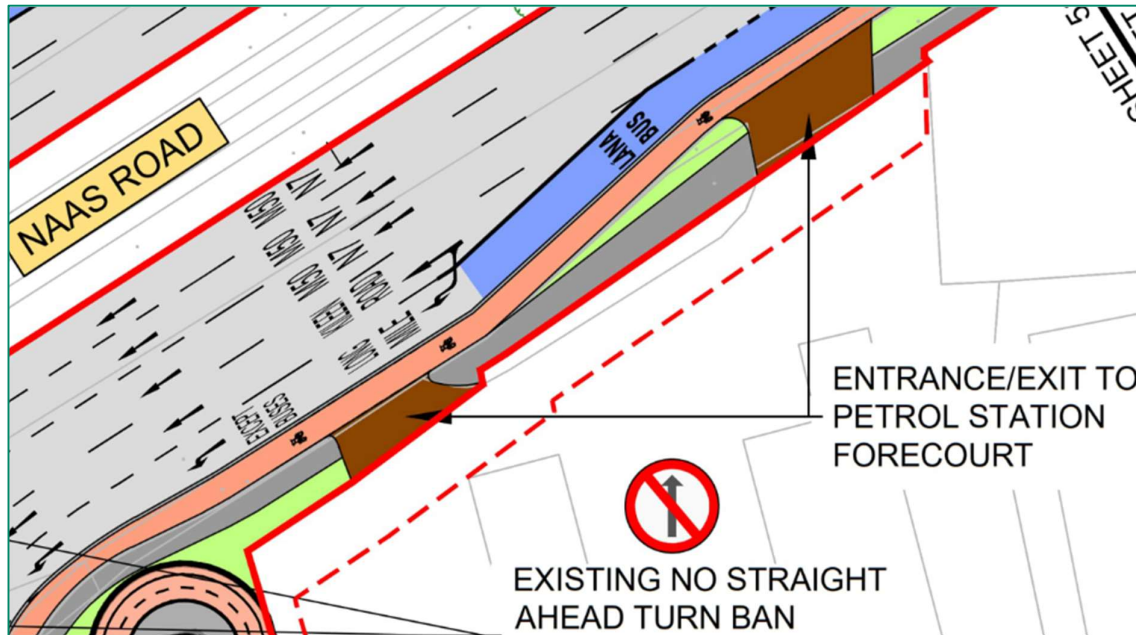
Extract from Proposed Scheme General Arrangement drawings showing proposed cycle track at Naas Road frontage (Image source: Google)
